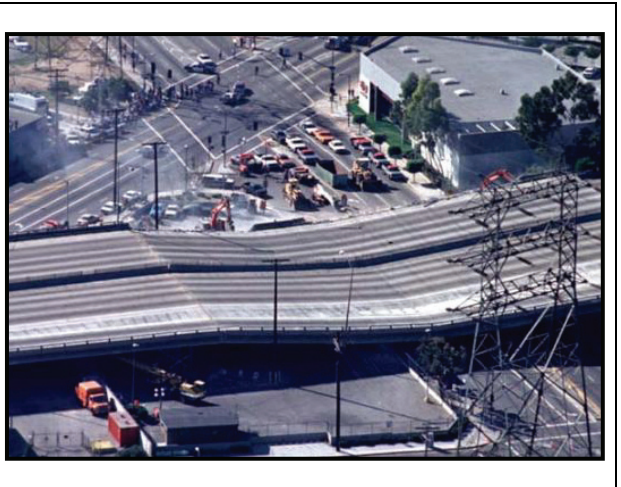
Severe Damage: Deck collapse (USDOT)
